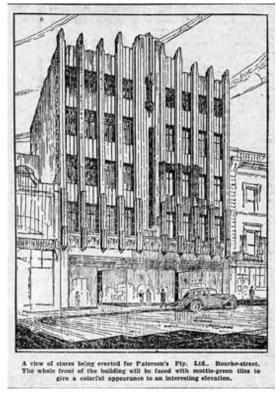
Purnell's sketch of the new Patersons building at 152-154 Bourke Street, 1934. (Source: Age 27 March 1934:5)
